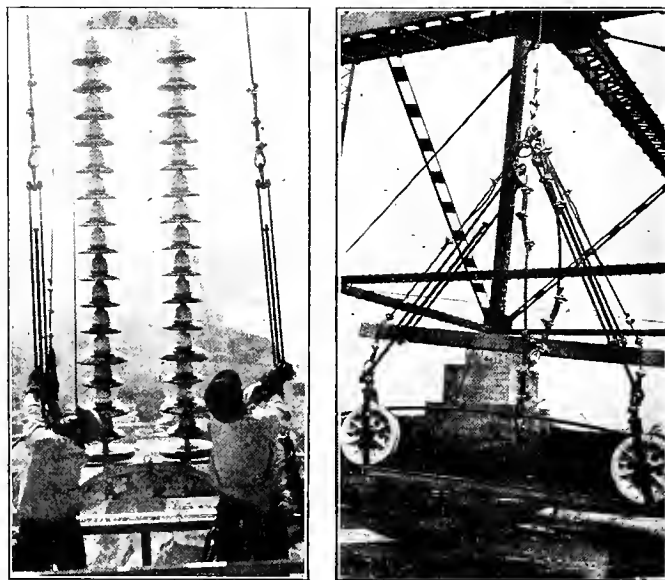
Sheaves and bridle with cable in place ready to be raised to the top of a tower for attachment to the insulator assembly (right). Cable in position (left) and linemen easing away on bridle to transfer strain to cable support on insulator strings.
